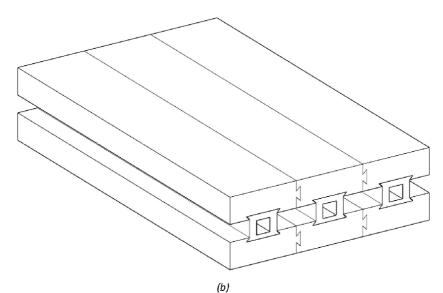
Dovetail wood elements as floor slab alternatives-4 (hollow type-2).
